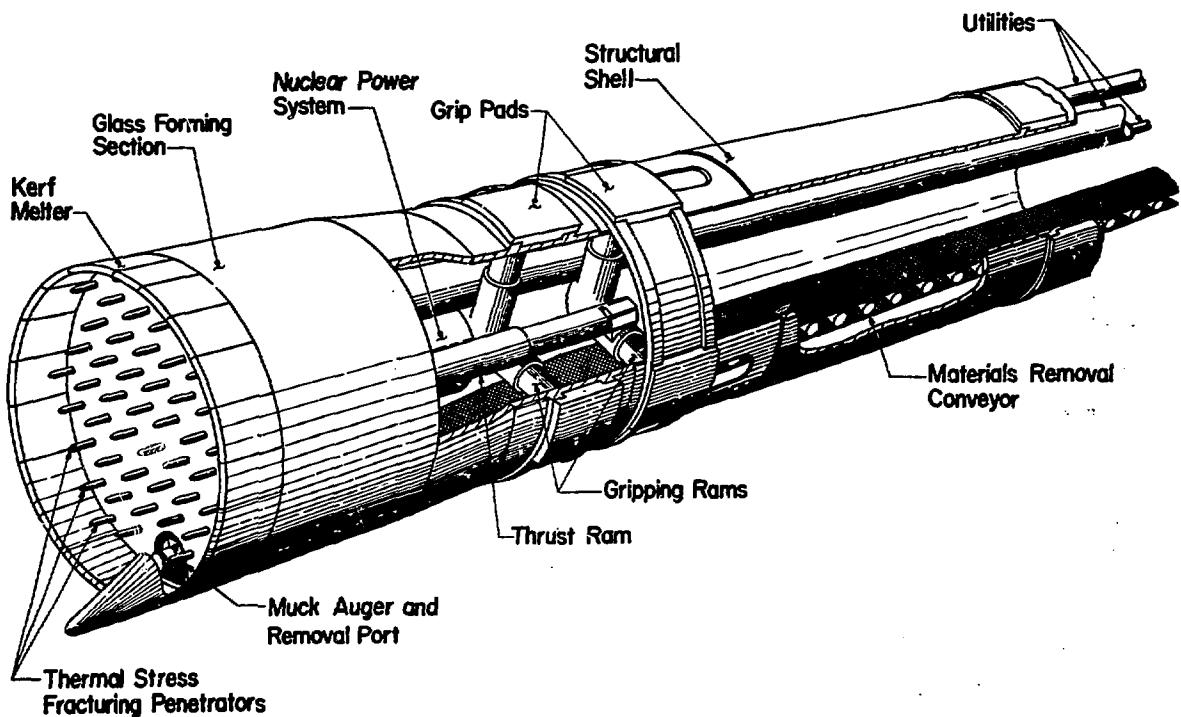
Design concept of the penetrating face of a hard-rock melting tunneler utilizing the kerfing technique and thermal stress fracturing.
